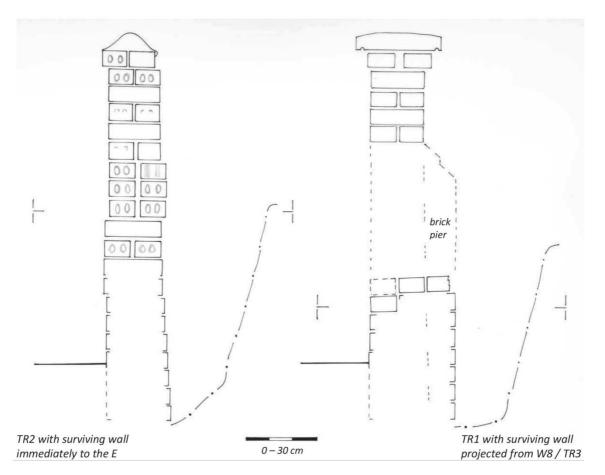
Composite sections / profiles across the brick wall in Trench 1 and Trench 2
